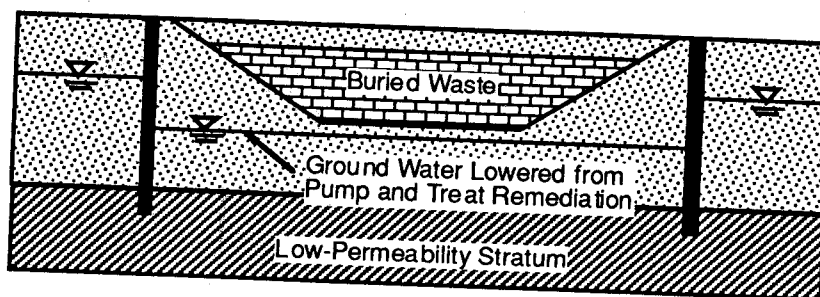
Example of Vertical Cutoff Wall to Restrict Inward Migration of Ground Water.
